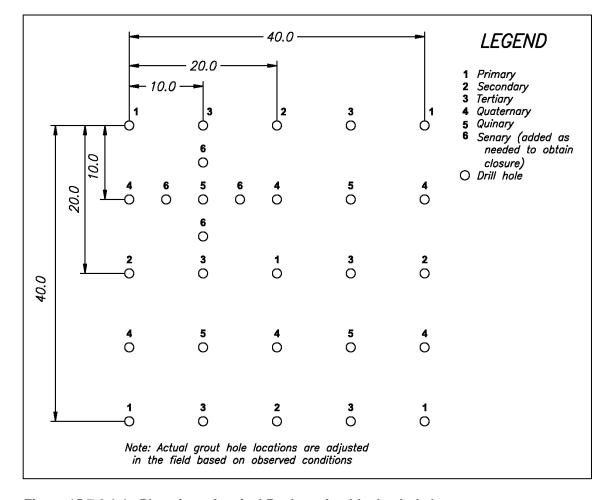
Plan view of typical Reclamation blanket hole layout.
